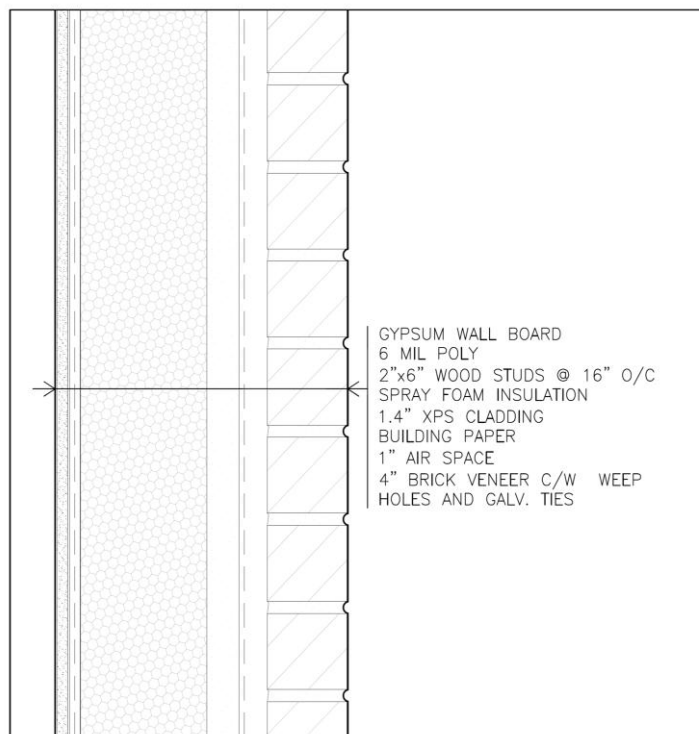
Wall Assembly Cross-Section (Twiddy, 2011)
